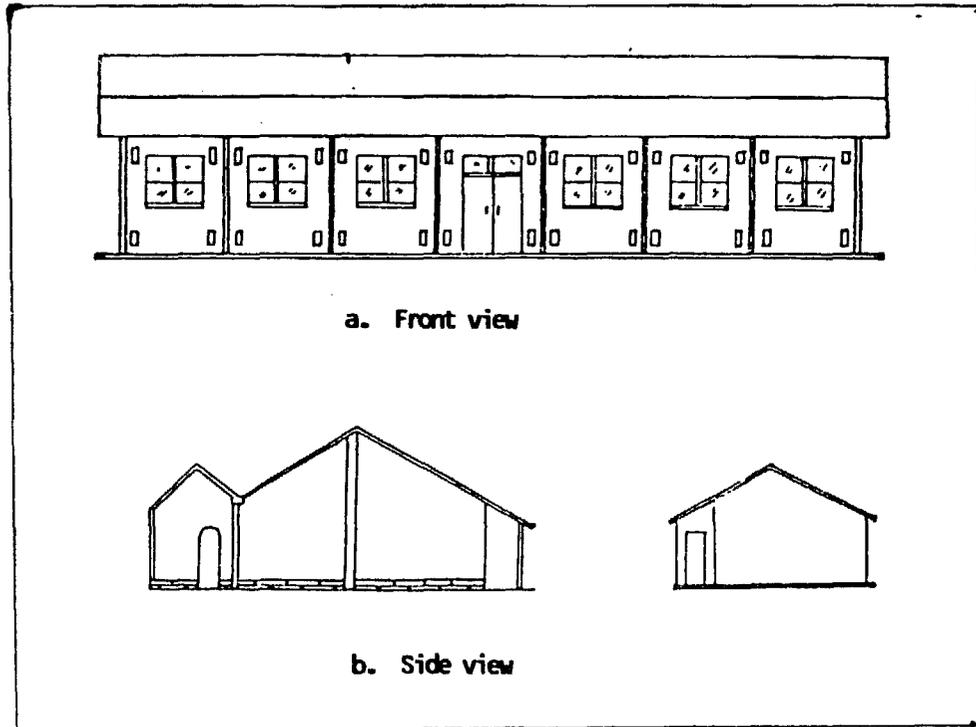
Design drawing of a one-storey house (Guangdong Province)
